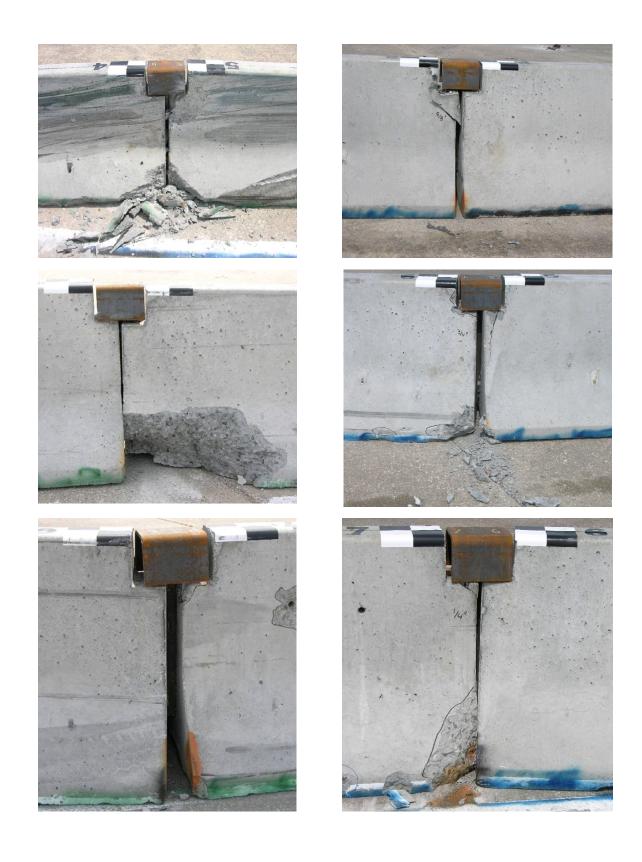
Joint Connection Damage for Joints 4-5, 5-6, and 6-7, Test NYTCB-2
